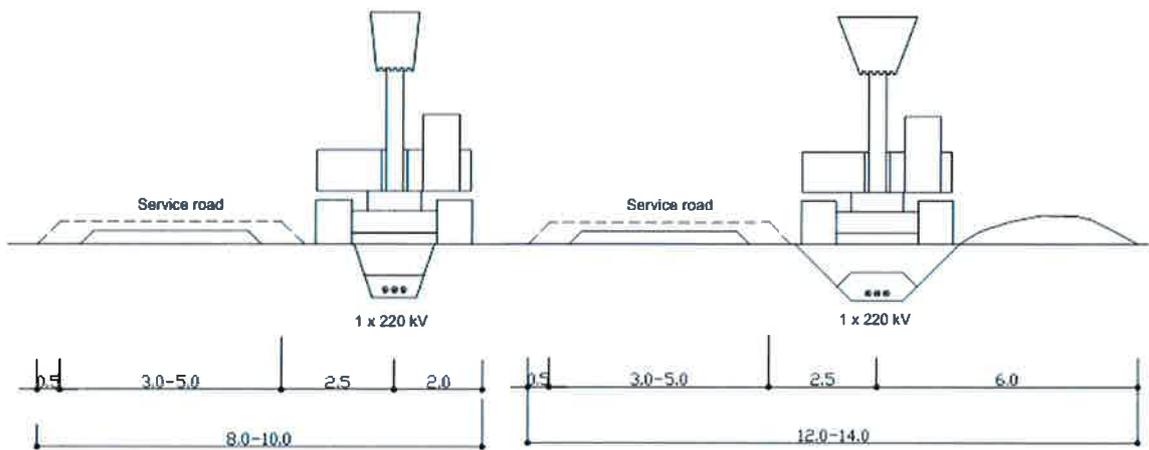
220 kV cable, minimum cross-section with service road. On the left excavated soil is removed from site. On the right excavated material is placed beside the trench.
